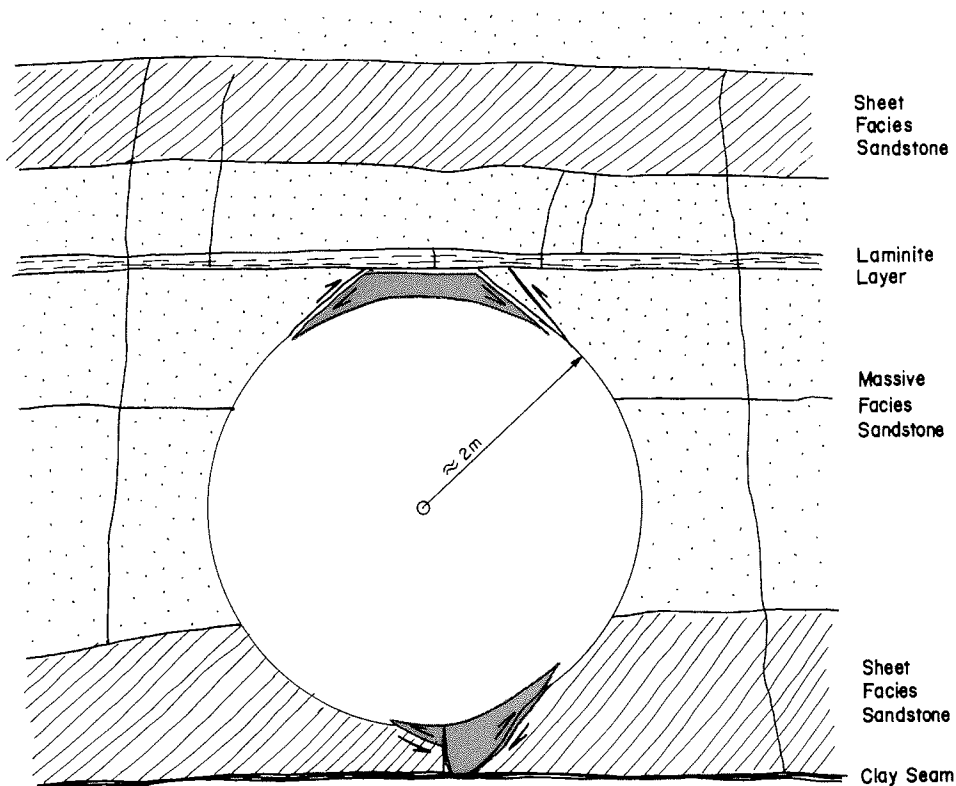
Typical stress induced failure in TBM tunnel of North Side Storage Project.
